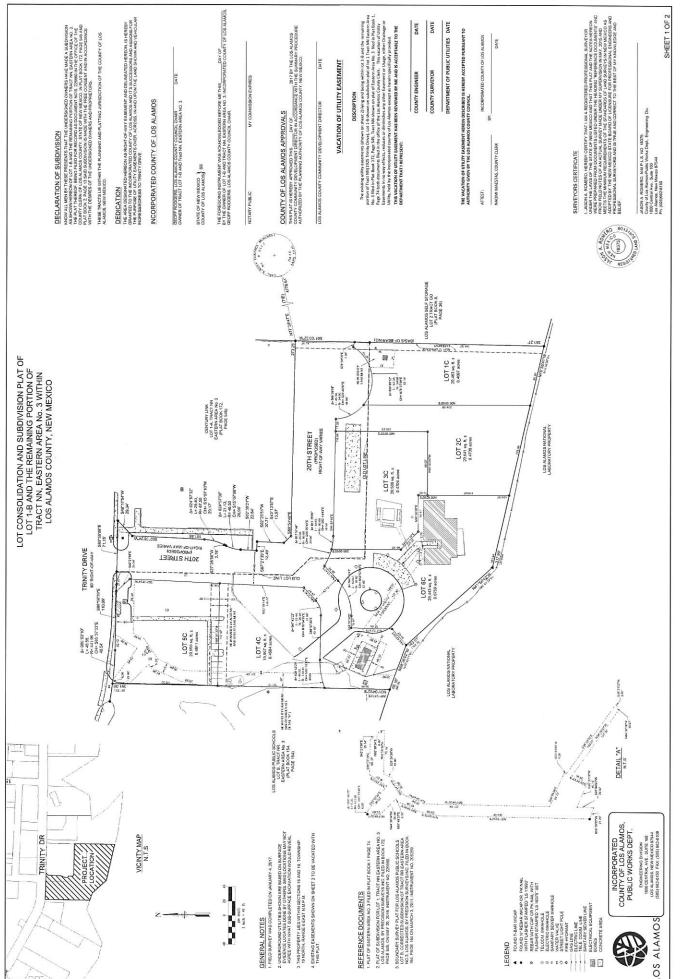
Proposed Consolidation and Re-subdivision (Sketch Plan & Preliminary Plat)
